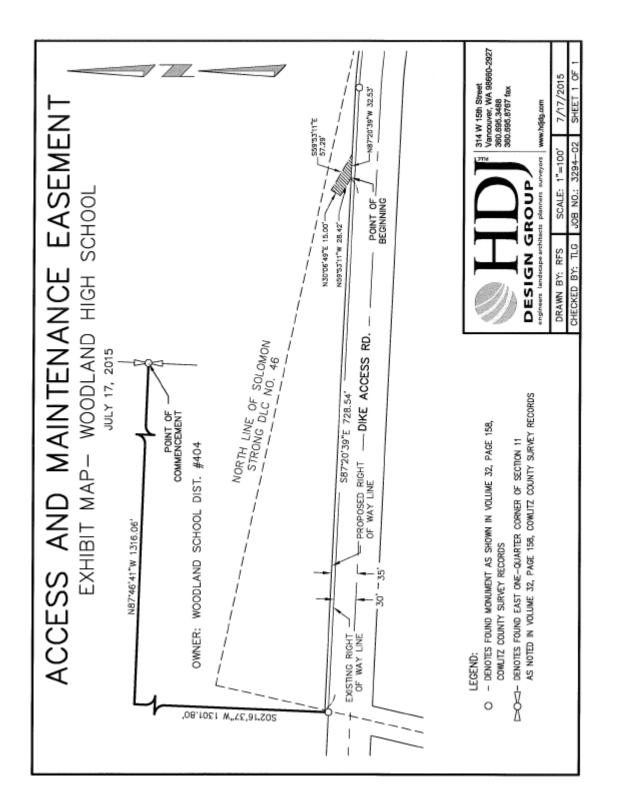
EXHIBIT D STORMWATER ACCESS AND MAINTENANCE EASEMENT NO. 4
